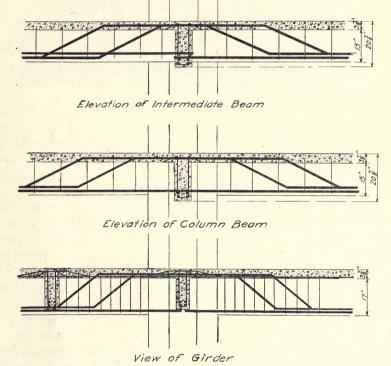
GENERAL POSITION OF REINFORCEMENT IN WENALDEN BUILDING.
